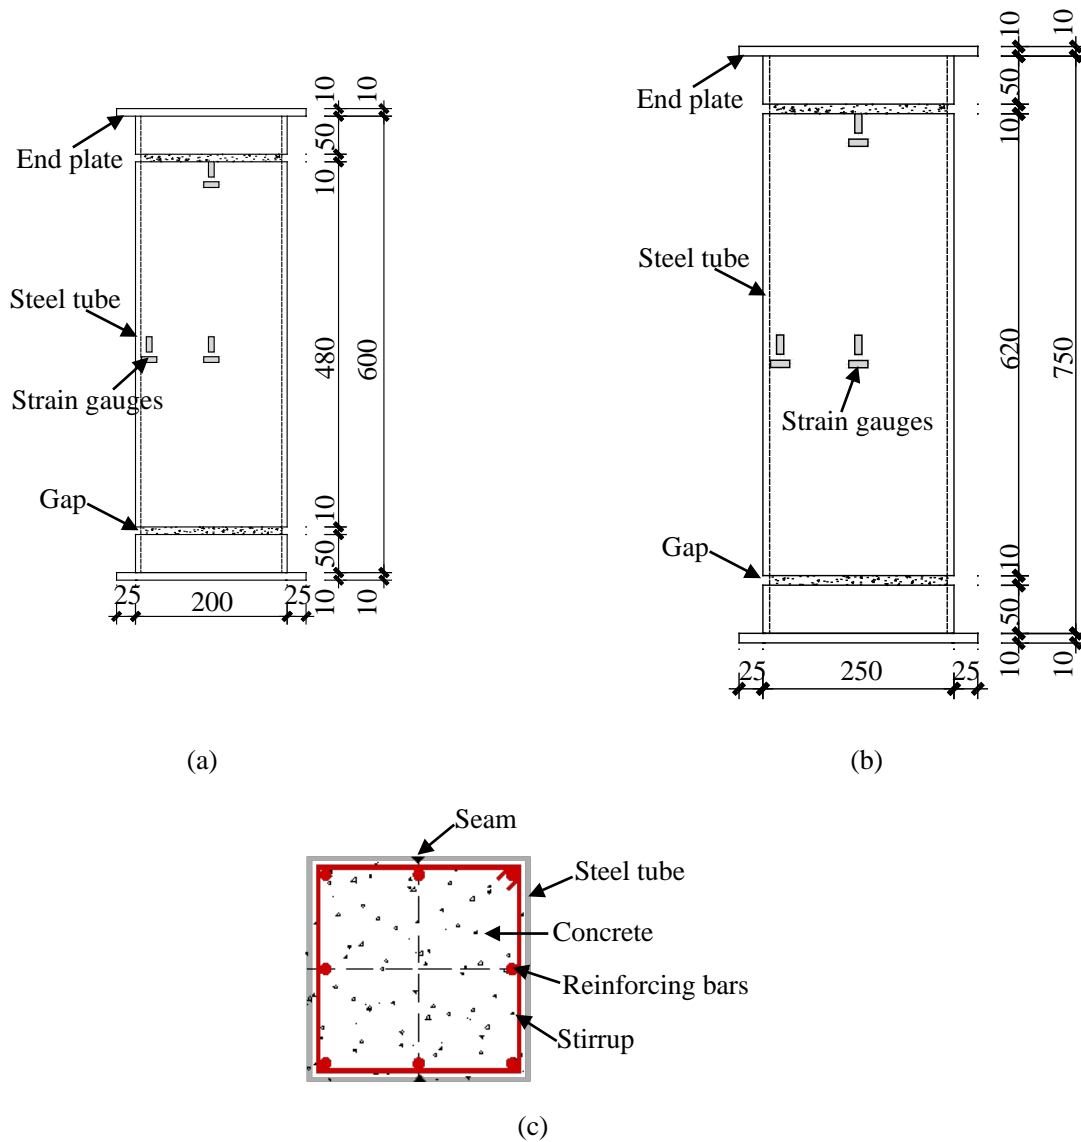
Details of specimens: (a) elevation of S200 specimen; (b) elevation of S250 specimen; and (c) cross-section (unit: mm).
